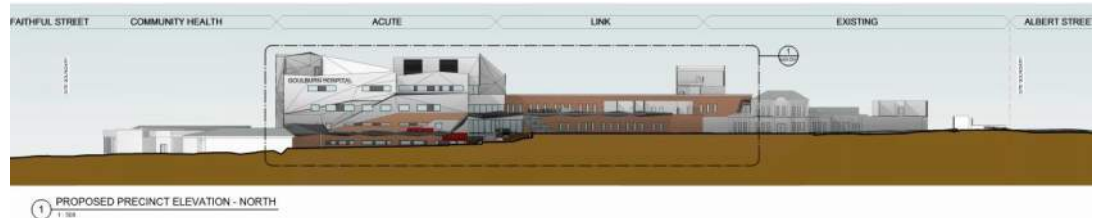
Precinct elevation showing the proposed works viewed from the north (toward Goldsmith Street) (Source: BLP)
